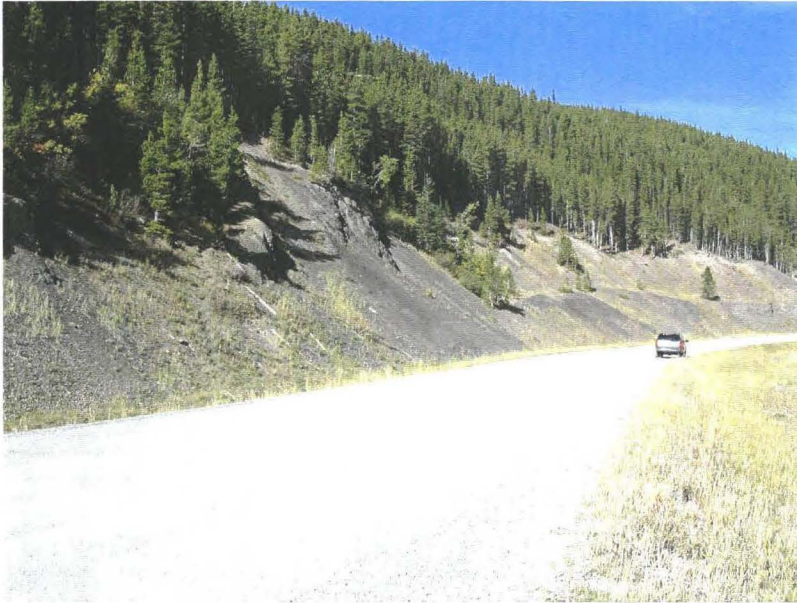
(top) – Facing northbound across the Km 15 Cut Slope site.
